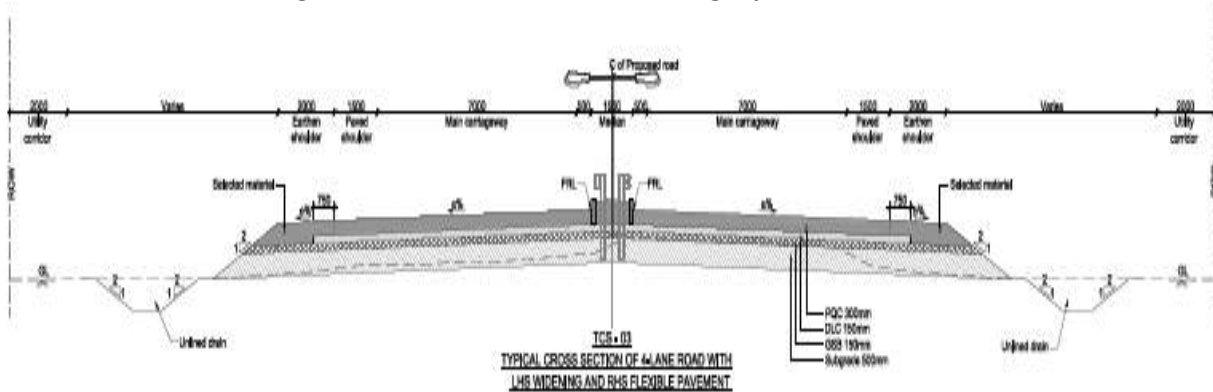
TCS-3 4-lane road with LHS widening and RHS flexible pavement
